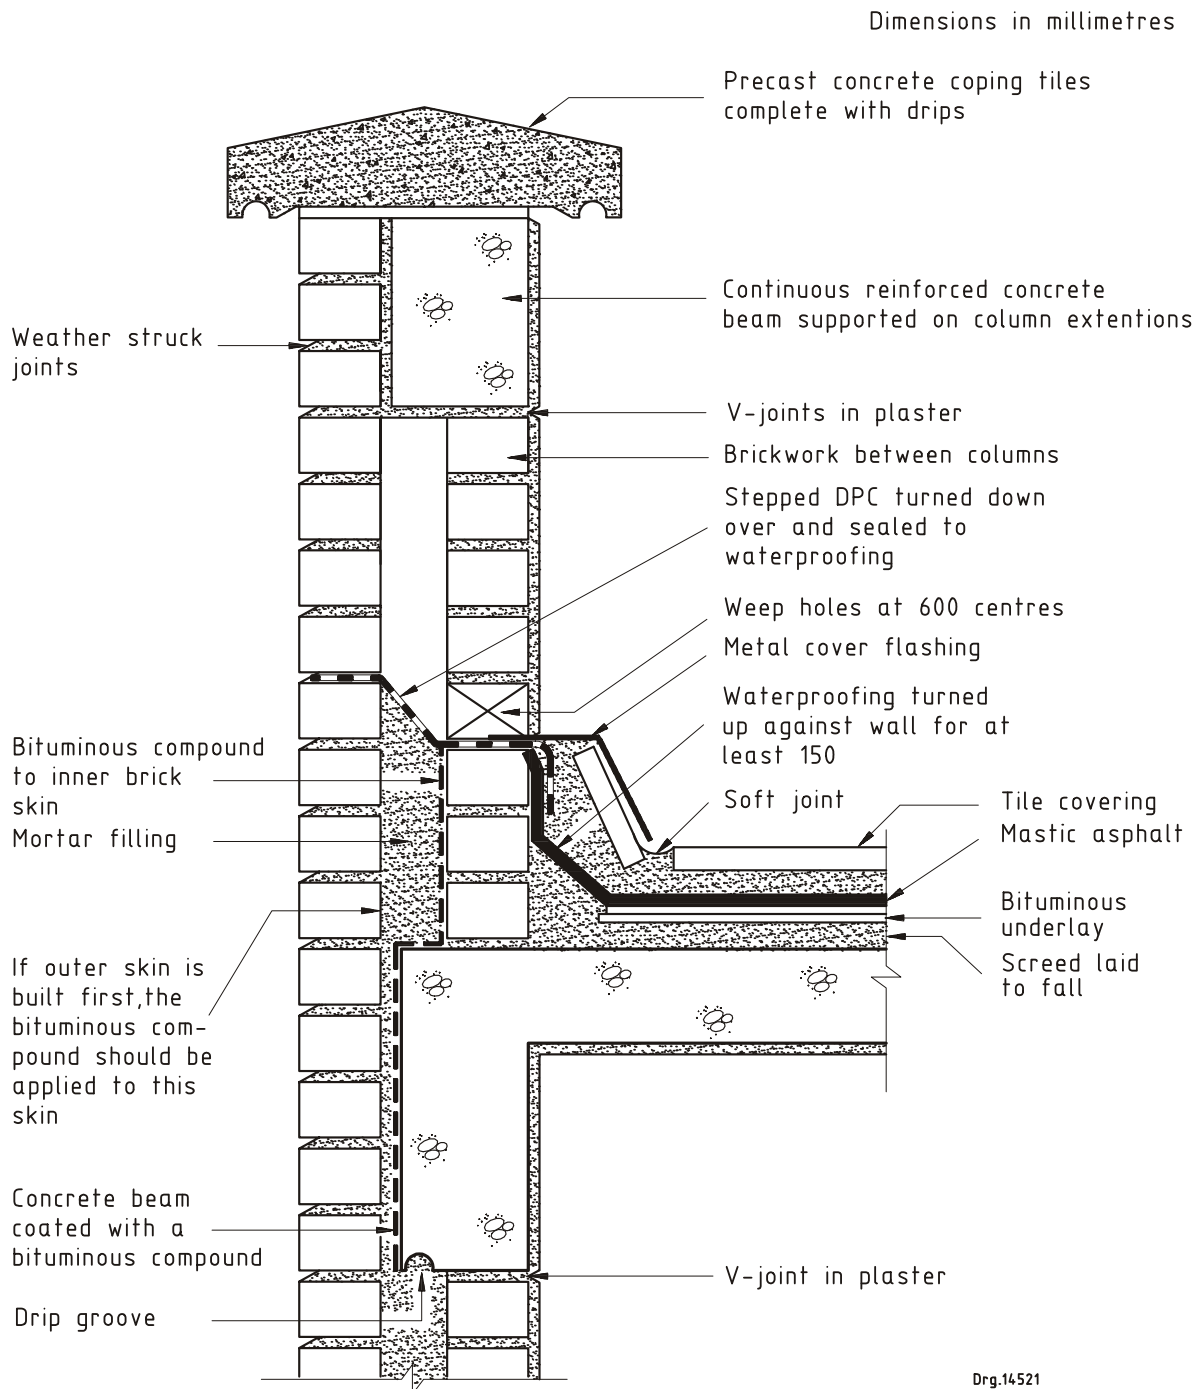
Cavity parapet wall with ring beam to limit differential movement
